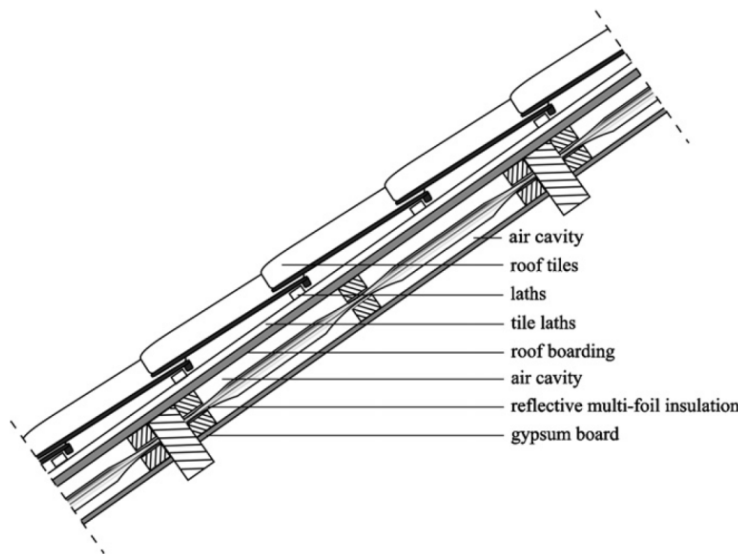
Reflective foil installed inside a cavity in a roof construction (Tenpierik and Hasselaar [72]).
